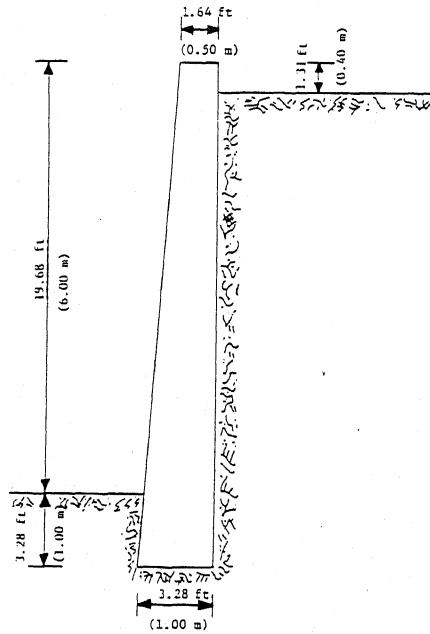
CROSS-SECTION OF WINGWALL AT LOCATION B-B (from Fig. 1)
